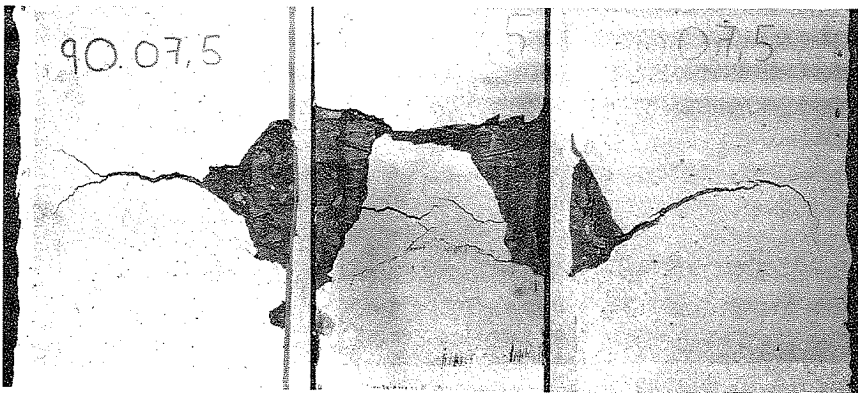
Failure of S.B.-specimen No. 90/07.5.
